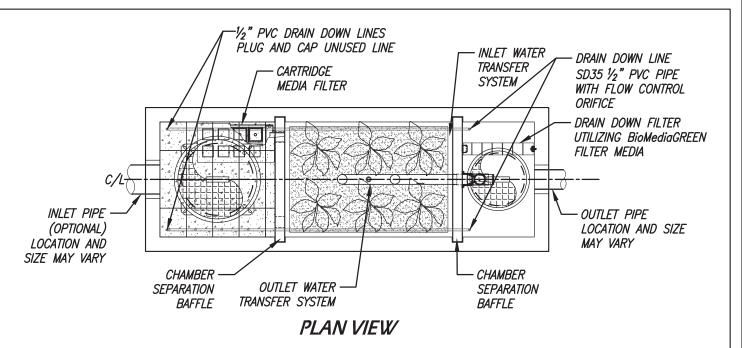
DETAILS FOR STORMTRAP SINGLETRAP SYSTEM AND BIOCLEAN MODULAR WETLANDS SYSTEM ARE NOT FOR CONSTRUCTION AND PROVIDED FOR REFERENCE ONLY, FINAL DETAILS FOR CONSTRUCTION WILL BE PROVIDED DURING FINAL ENGREENING.
